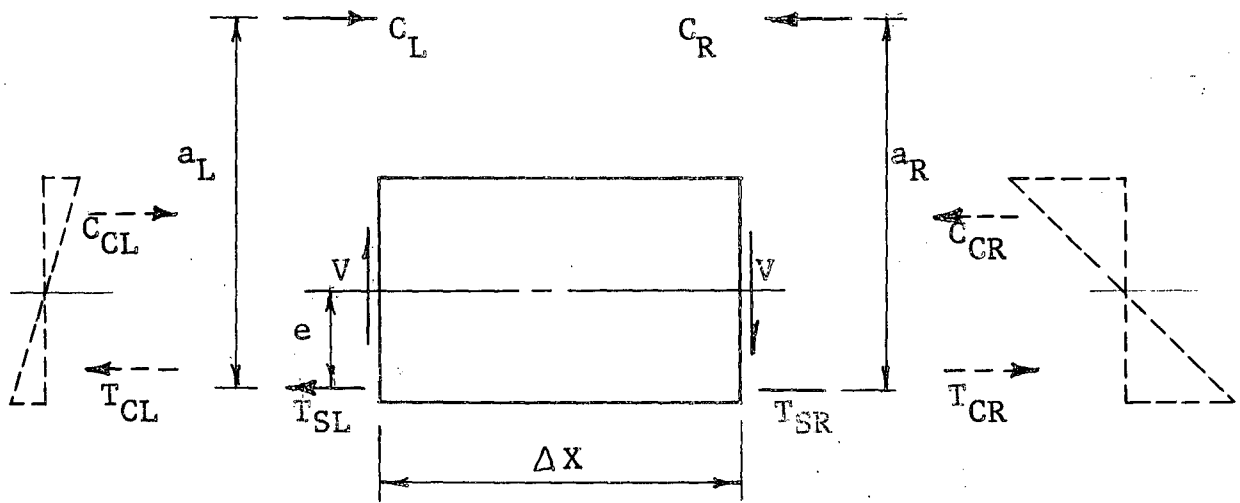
Forces Acting on an Element of a Non-Prestressed Beam
